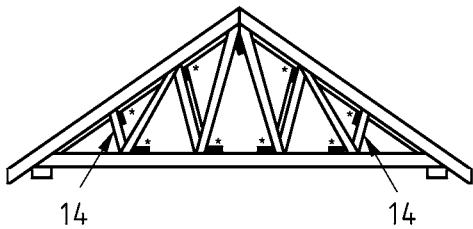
Standard bracing for rafter and web members of duopitch trussed rafters
